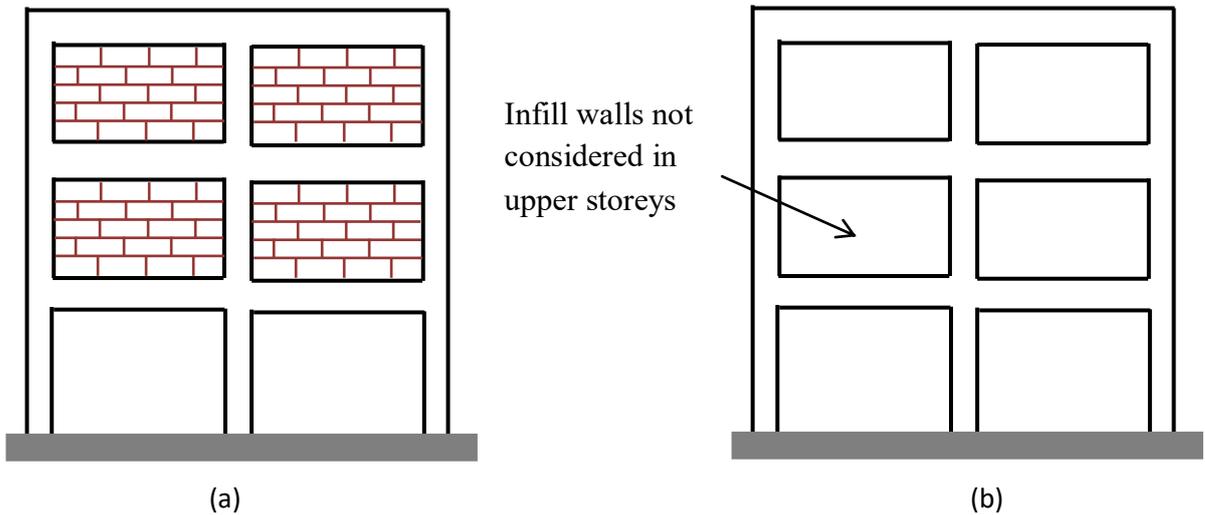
Buildings with open ground storey (a) actual building (b) building being assumed in current design practice
